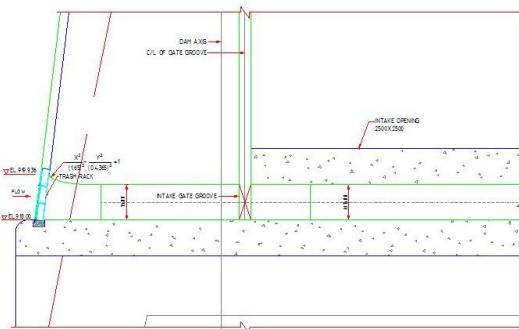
Trash rack arrangement and intake opening –sectional view
